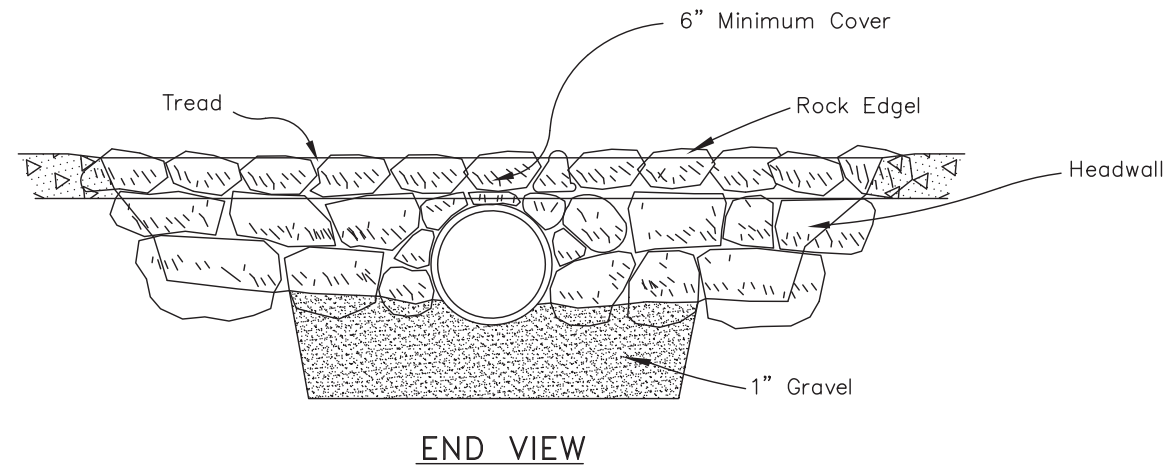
End view of a trail headwall drainage culvert. These structures can be built in a variety of sizes to fit the need of a specific trail. They will be installed in areas that stormwater run-off is causing the trail to be washed away.
